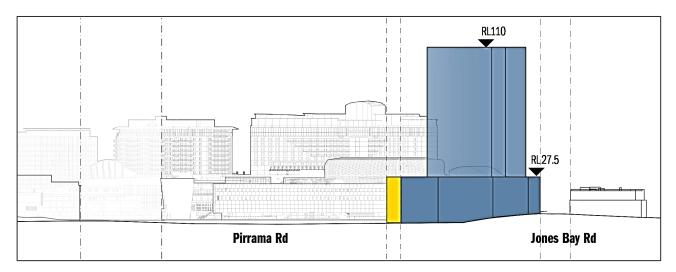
Building envelope section: Pirrama Road (Hassell)
